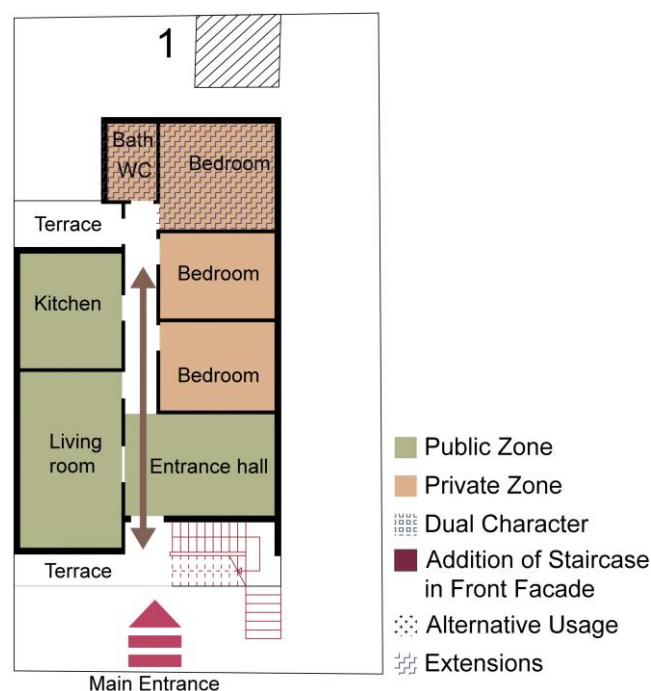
Upper floor sample of leading type II with the addition of staircase in front façade (Author, 2017)
